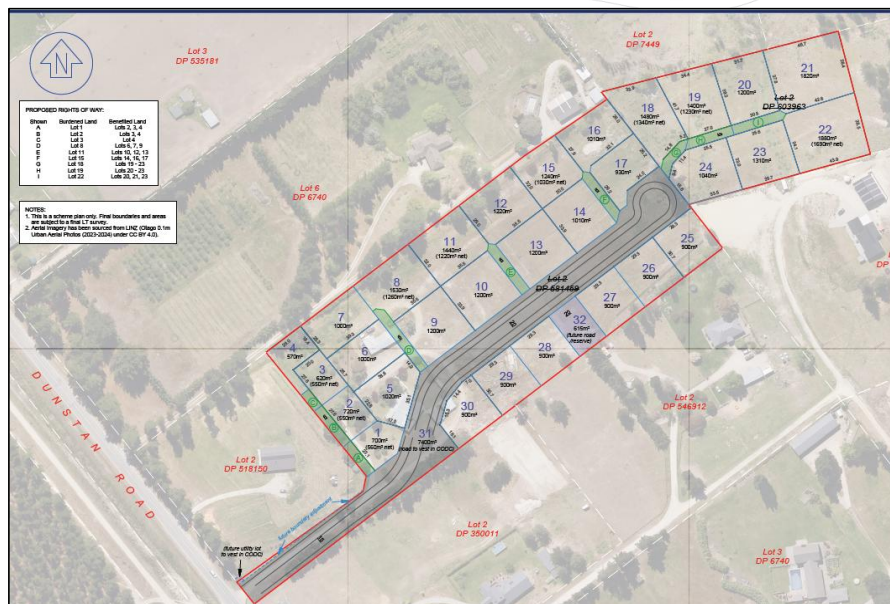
Excerpt of the subdivision plan in Attachment 1 (Calder Surveying).
